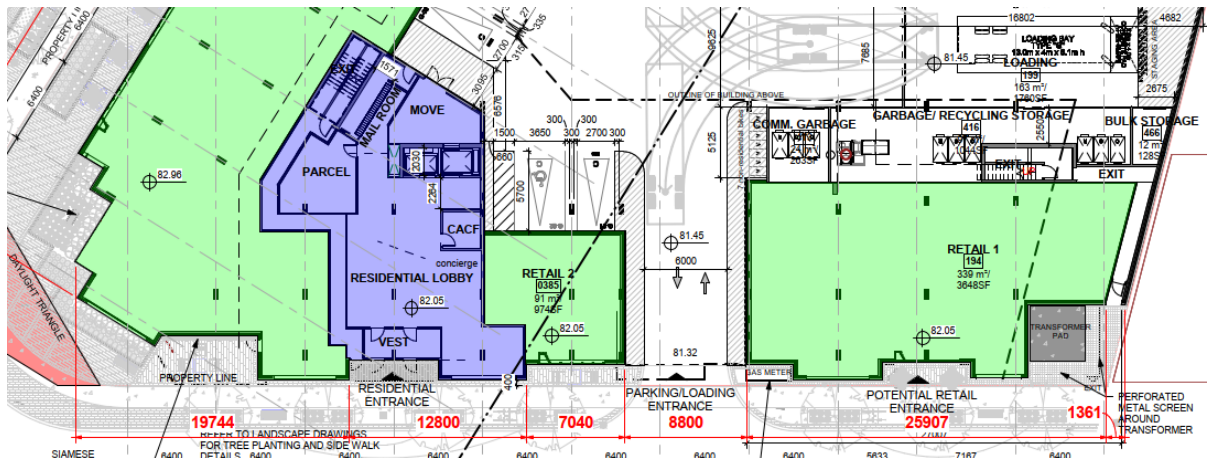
Ground Floor Plan – Land Use Sketch (Drawing A103A)
